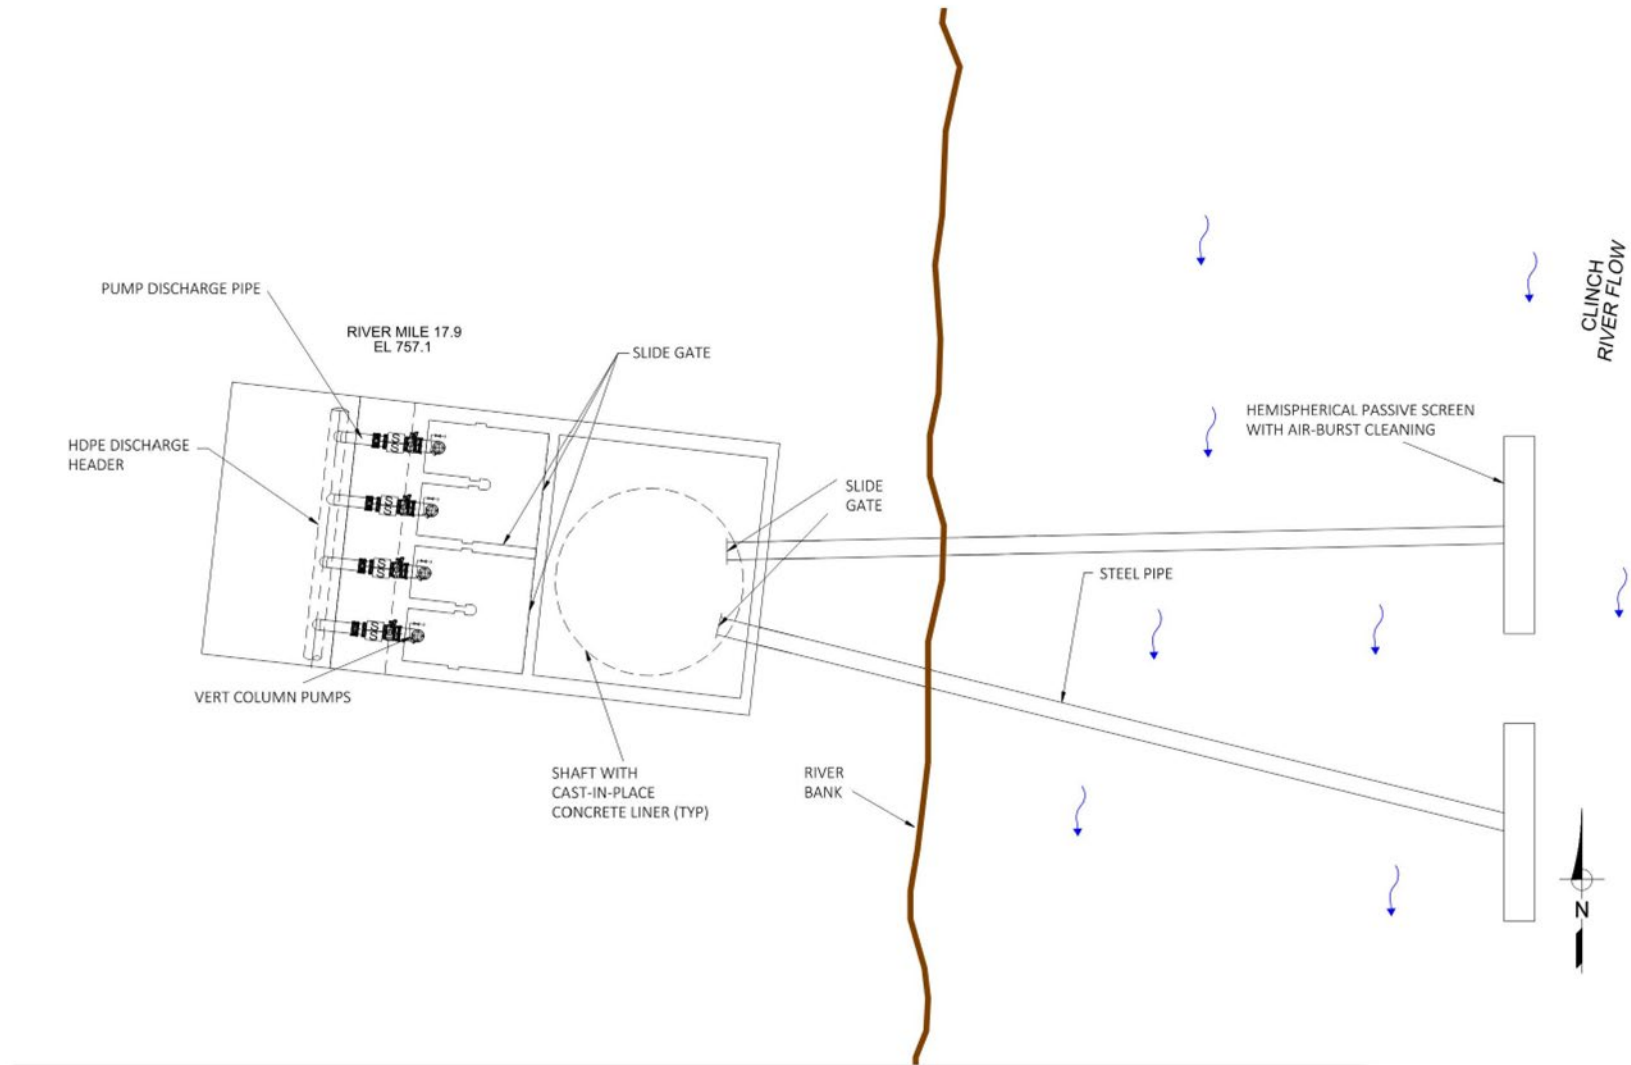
Submerged Offshore Intake Alternative Structure Plan
